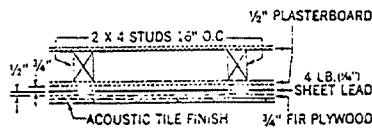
Section through the wall employed in the Franklin Institute test room. The original drywall (gypsum board faces and wood stud framing) existed and the lead and finish were added.
